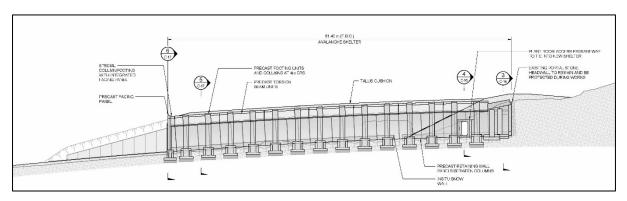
Design drawing showing the north elevation of the proposed avalanche shelter (not to scale).⁷¹
